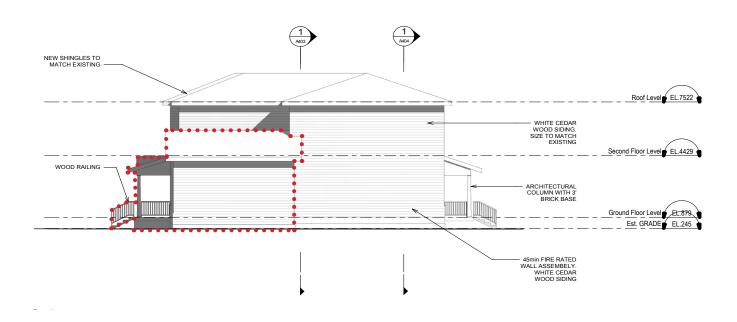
East Elevation. Red dotted line indicates outline of existing garage and front porch (beyond) to be incorporated into proposed addition/renovation. Drawing by Third Layer Architects, 2021.
